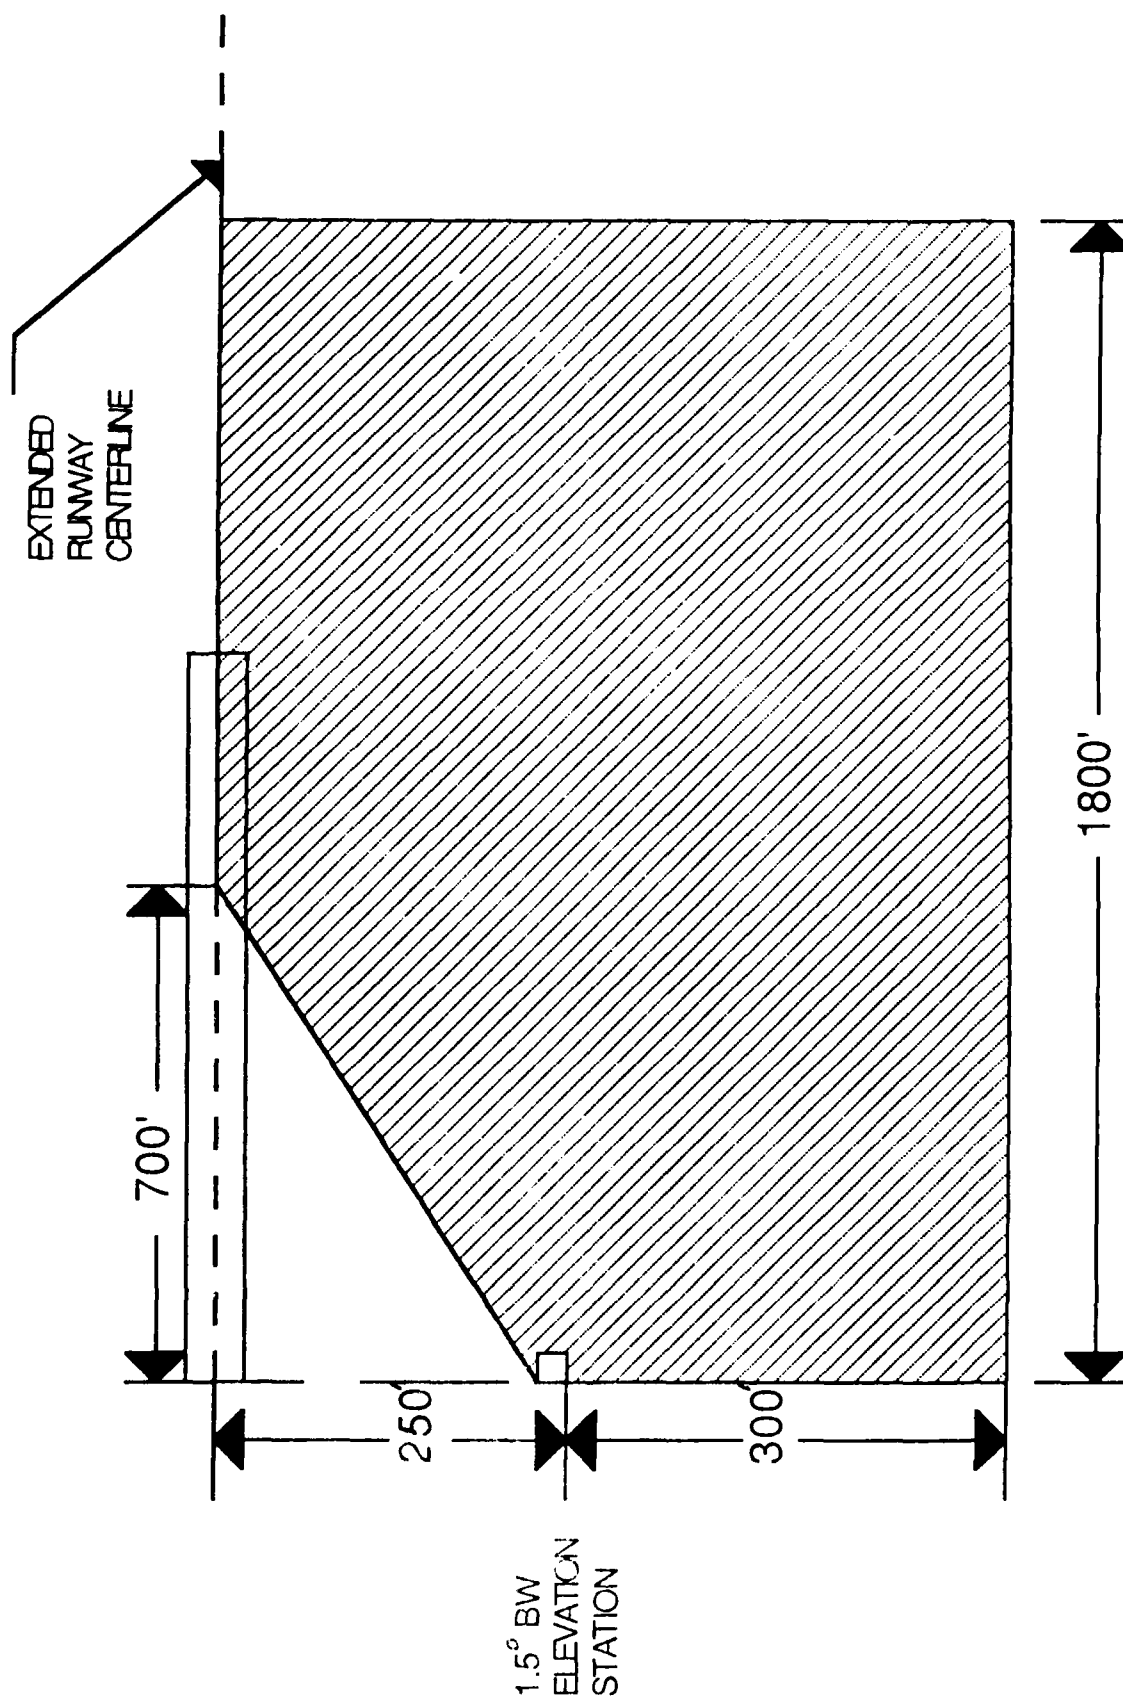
Elevation Site Critical Area for a 1.5° Beamwidth Antenna (Plan View).
